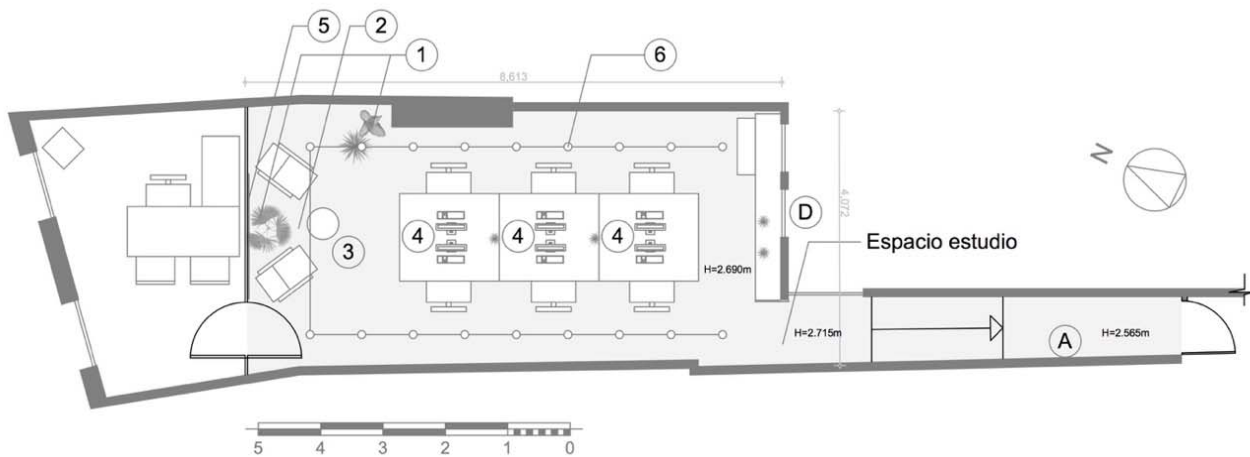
Layout of the space studied, initial situation: A. Study wall location, B. Meeting table, C. Glazed wall with a screen for video conferences, D. Blocked windows.
